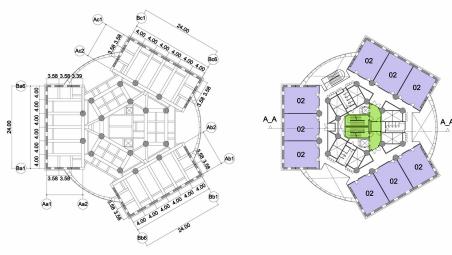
g - Comparing timber (floor plans: left) with steel (floor plans: right)
